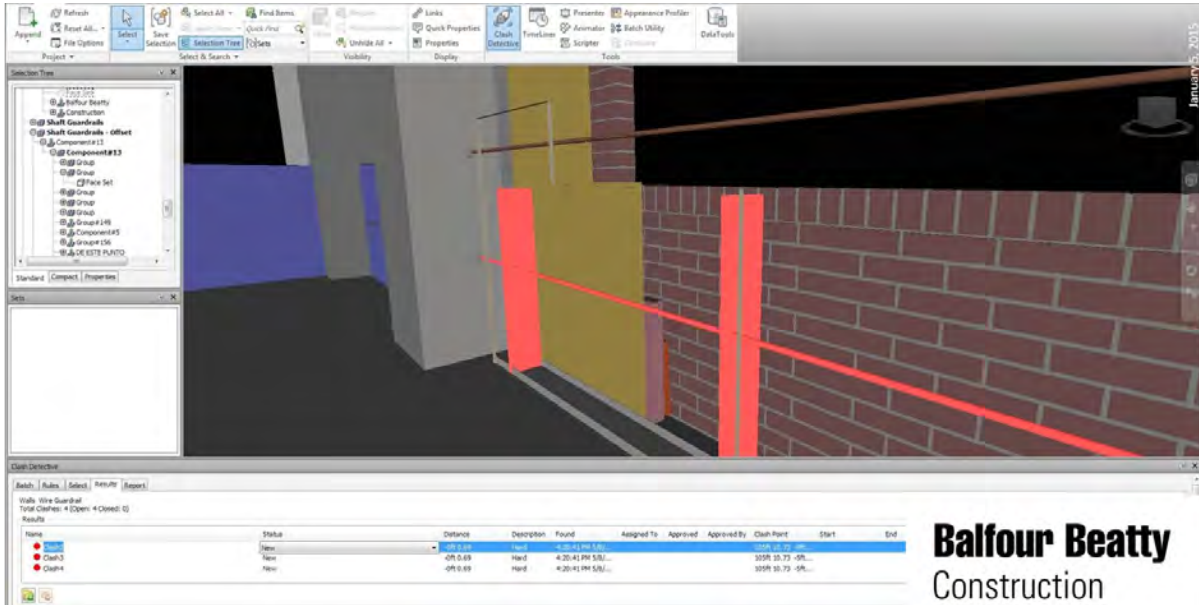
Perimeter cable guardrail clash with exterior wall skin detected using BIM (Picture Courtesy Balfour Beatty Construction)
